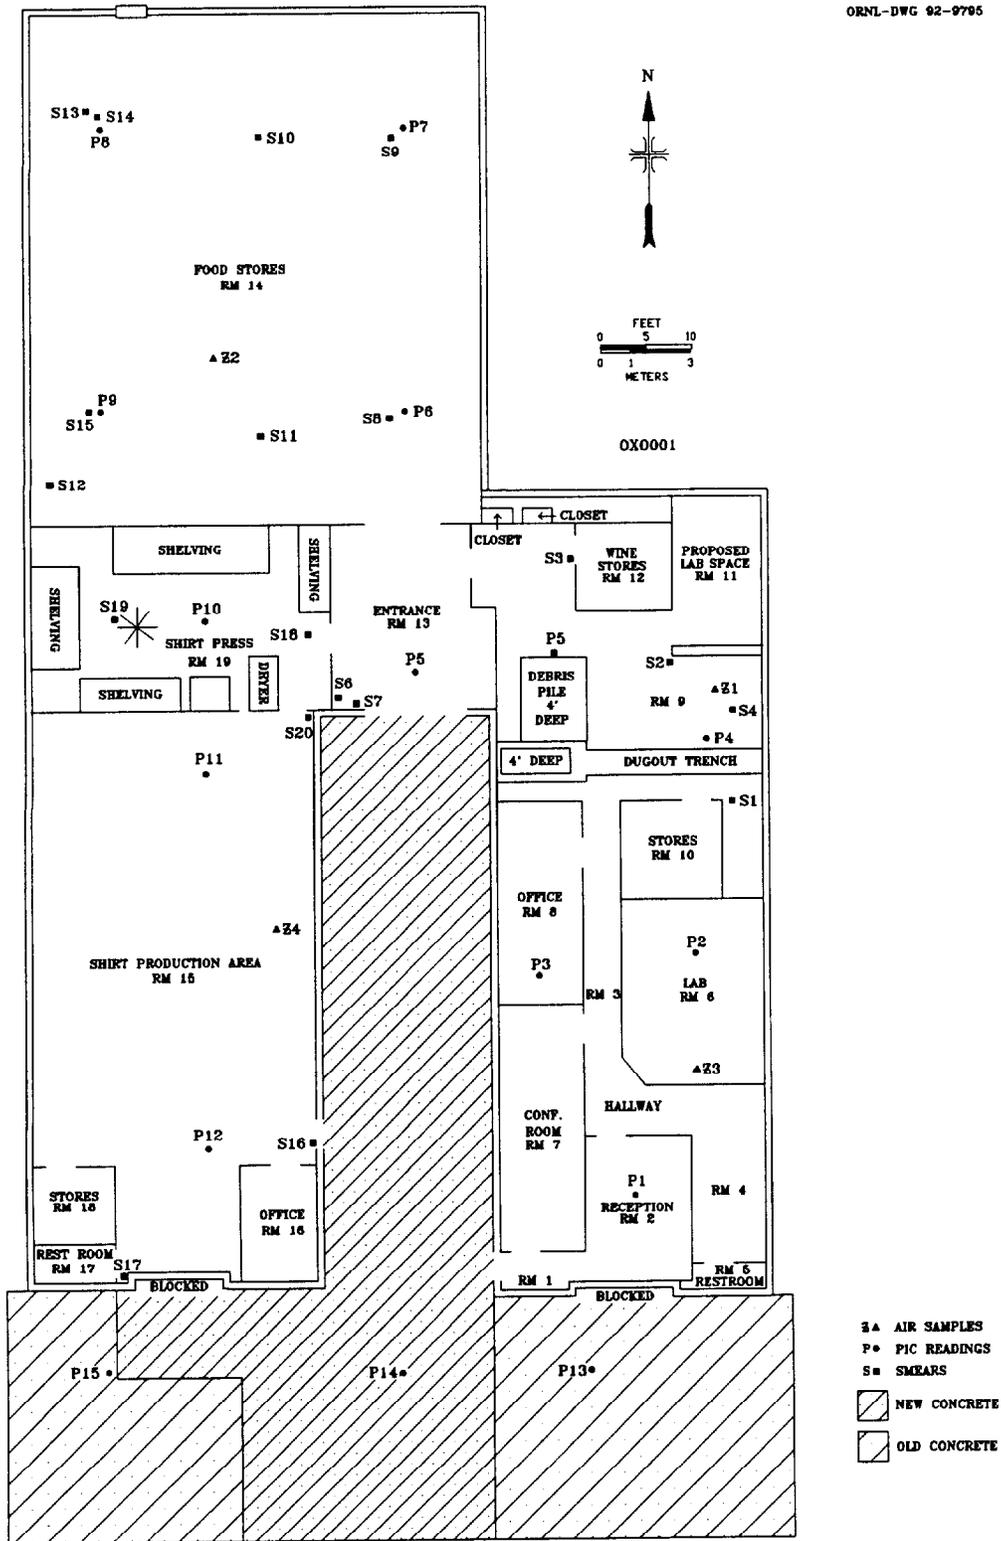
Locations of air samples (Z), PIC readings (P), and smears (S) inside the former Alba Craft Laboratory.
